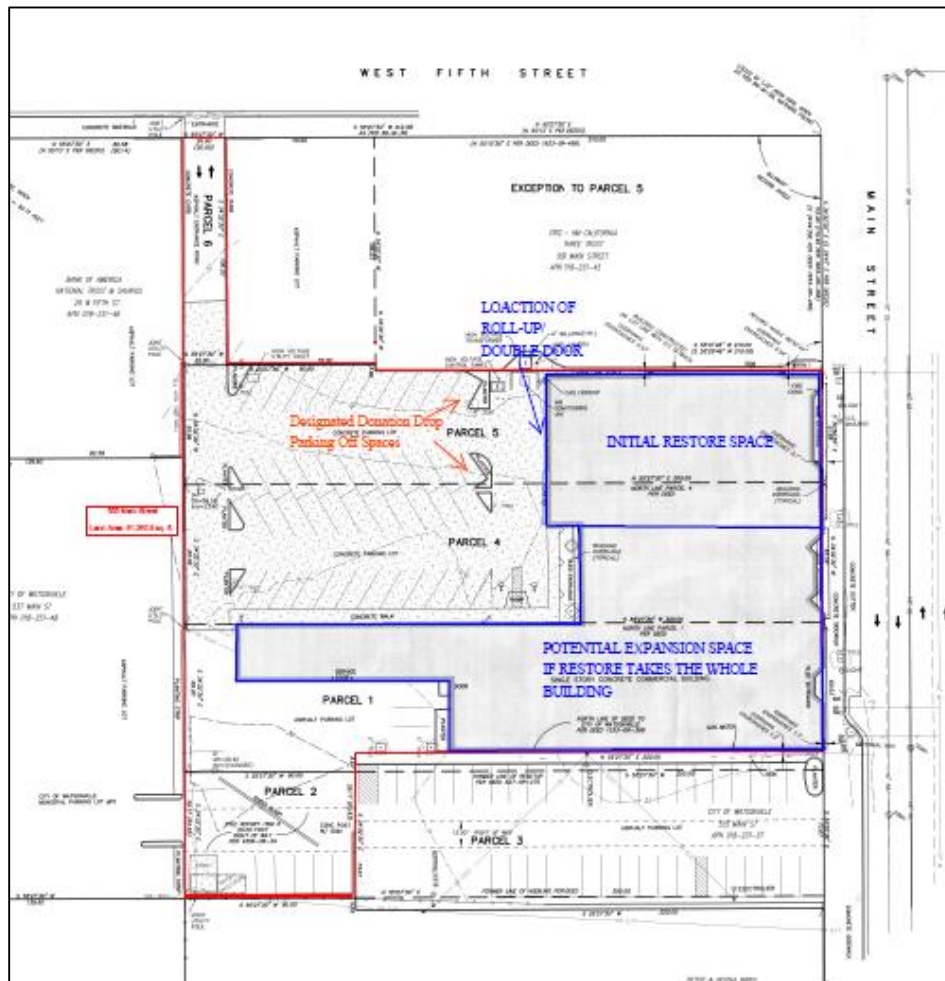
Site Plan – Expansion Plan and Donation Drop-Off
